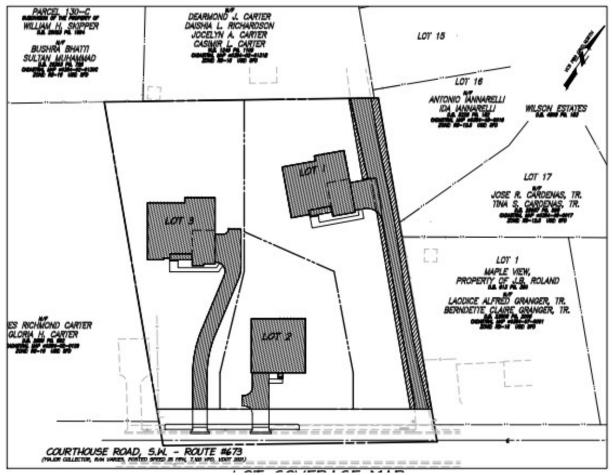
Proposed Lot Configuration excerpt from submitted plans.
